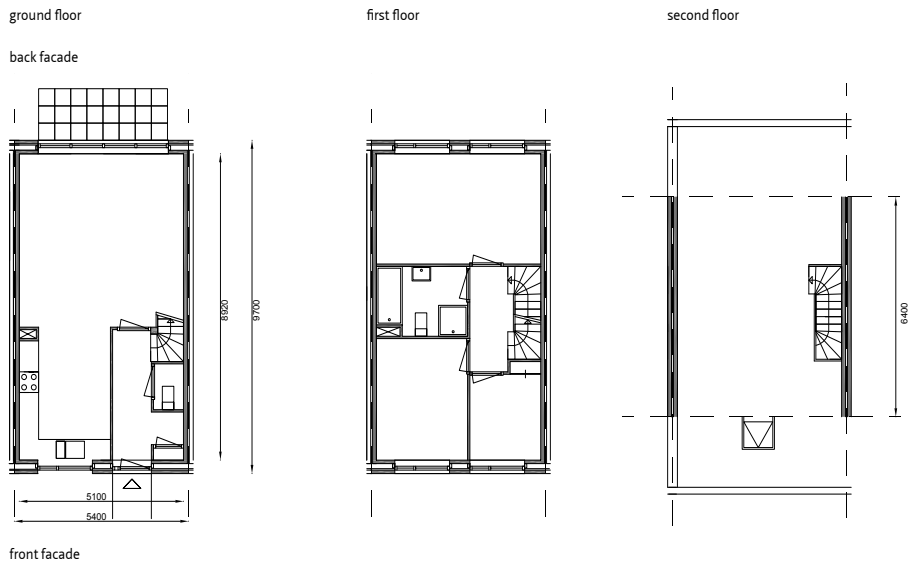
Floor plans of mid-terraced dwelling.
